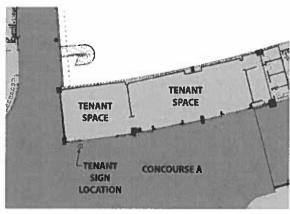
TENANT SPACE - CONCOURSE A - PLAN
